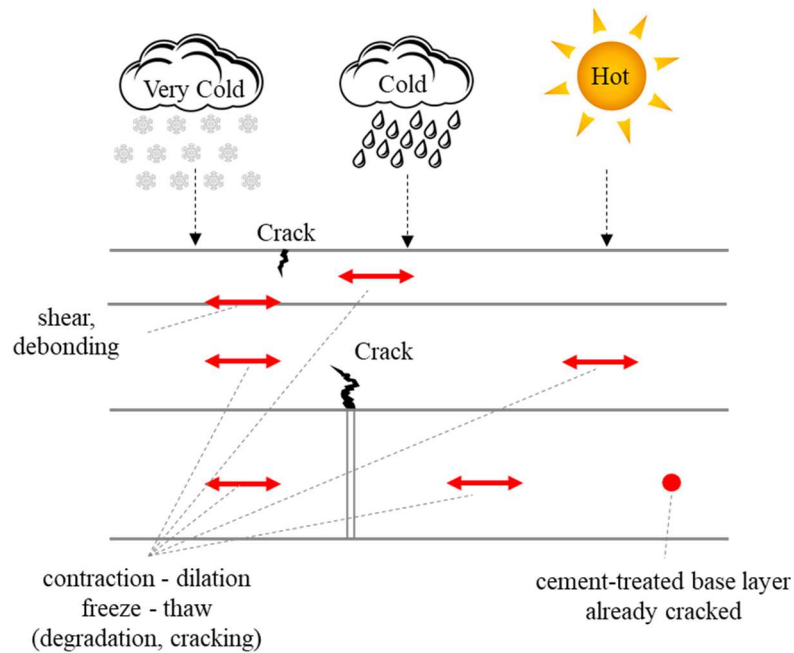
Scheme of thermal loading and corresponding pavement response (adapted after Di Benedetto, 1998)
